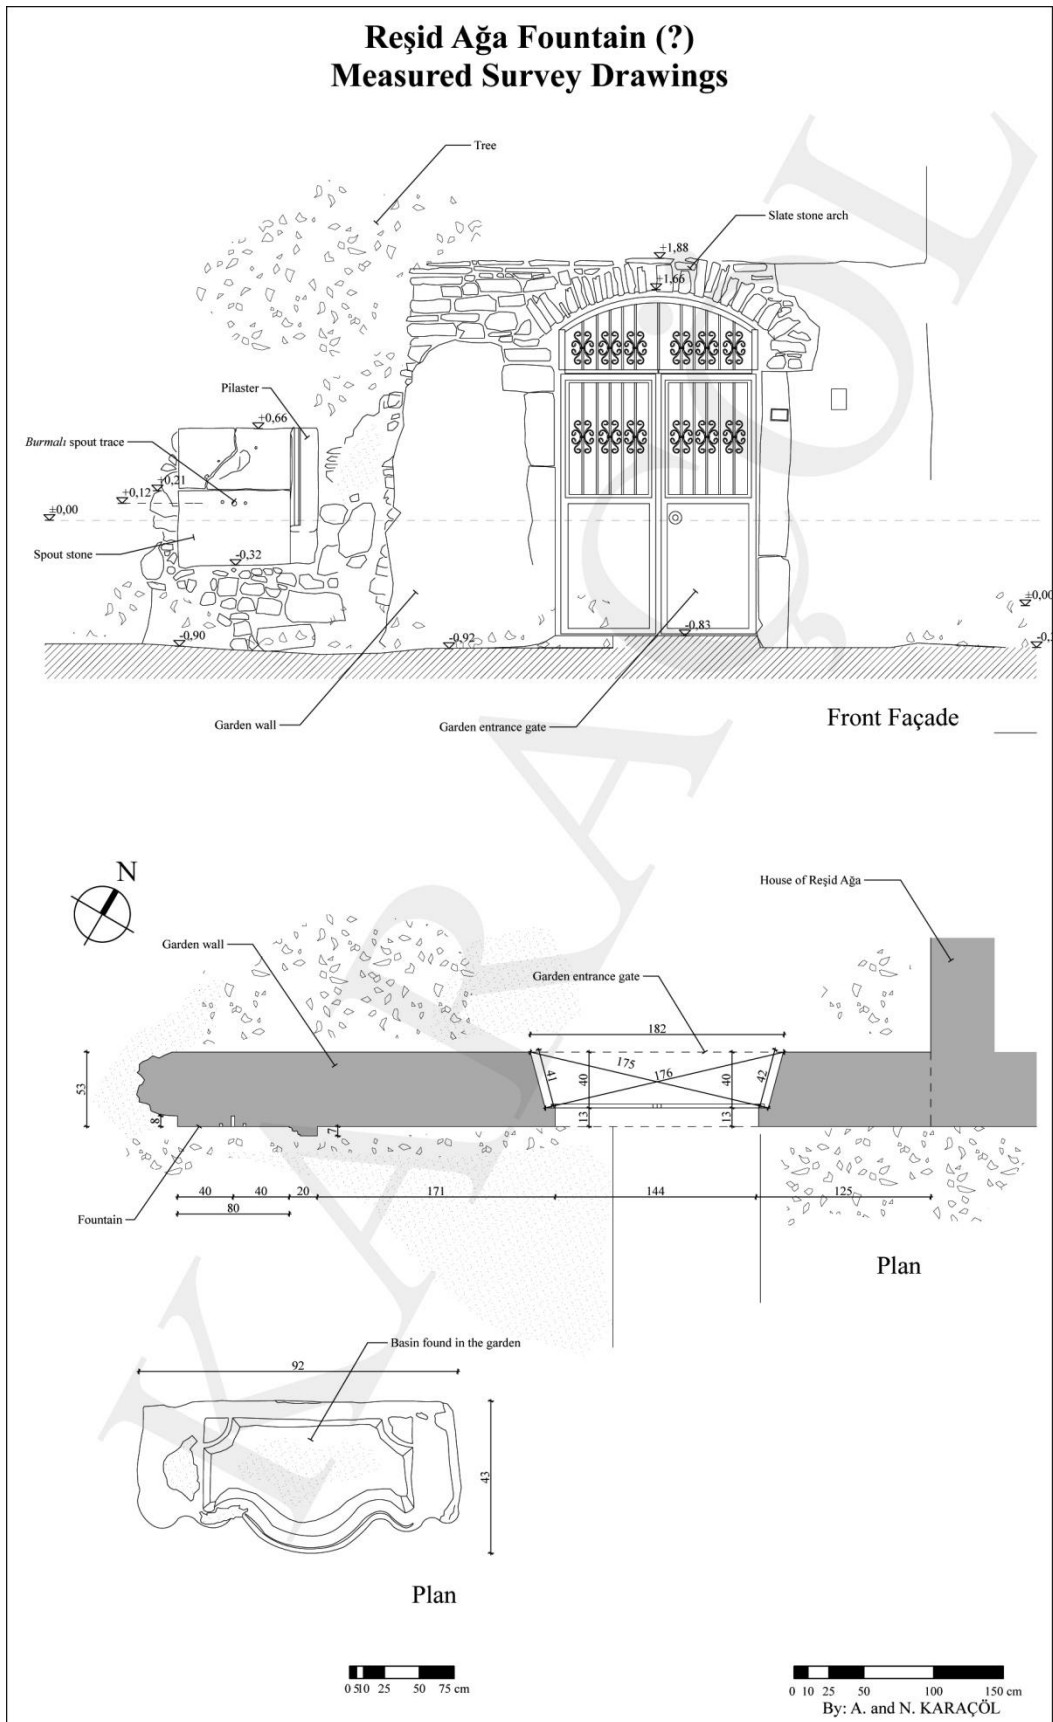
Reşid Ağa Fountain front façade and plan drawings
